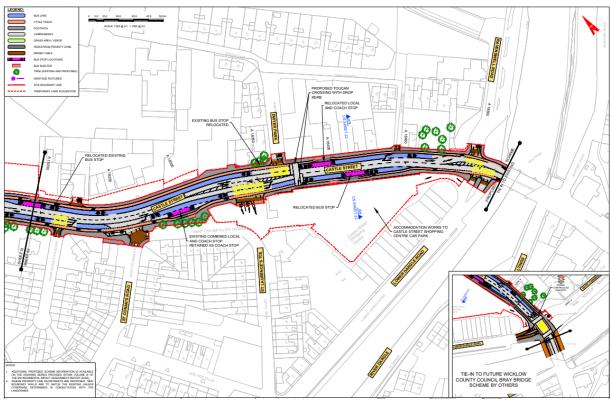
Extract from General Arrangement Drawing on Castle Street, Bray (Sheet 52)
